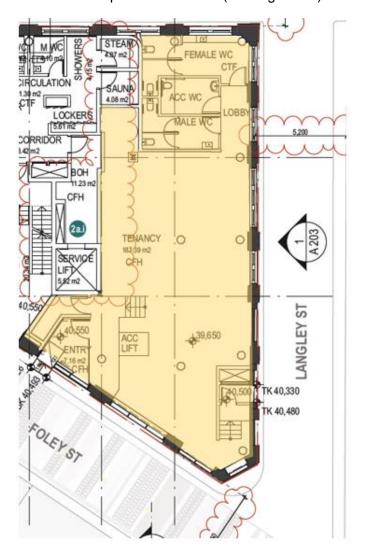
Extract from proposed layout of the ground level tenancy (highlighted in yellow)
